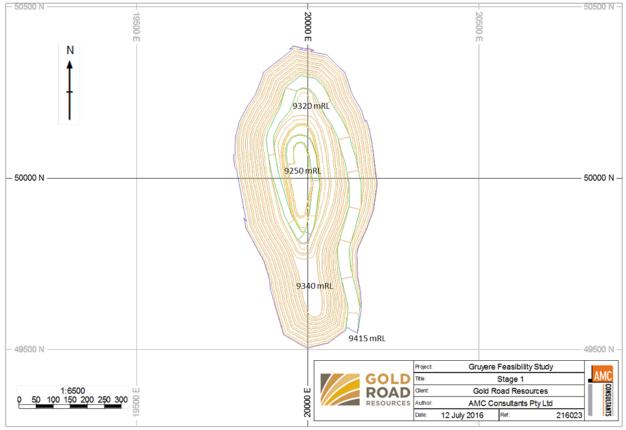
to Figure 16-9 show plan views of the final pit profile for each of the four pit stages.
